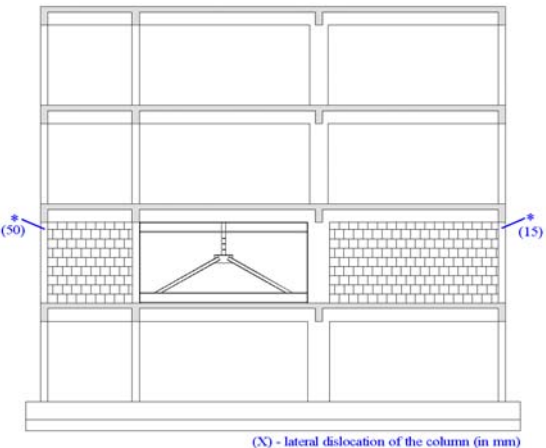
Frame B (brick infilled 2<sup>nd</sup> storey and K-bracing with shear-link in the internal bay): damaged joints after cyclic tests
